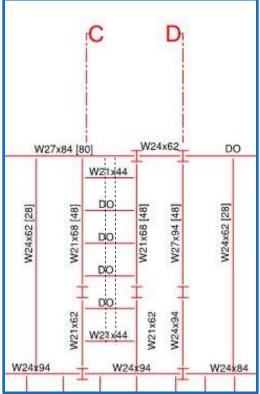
Enlarged View of 2<sup>nd</sup> Floor Framing at Garage Entrance
